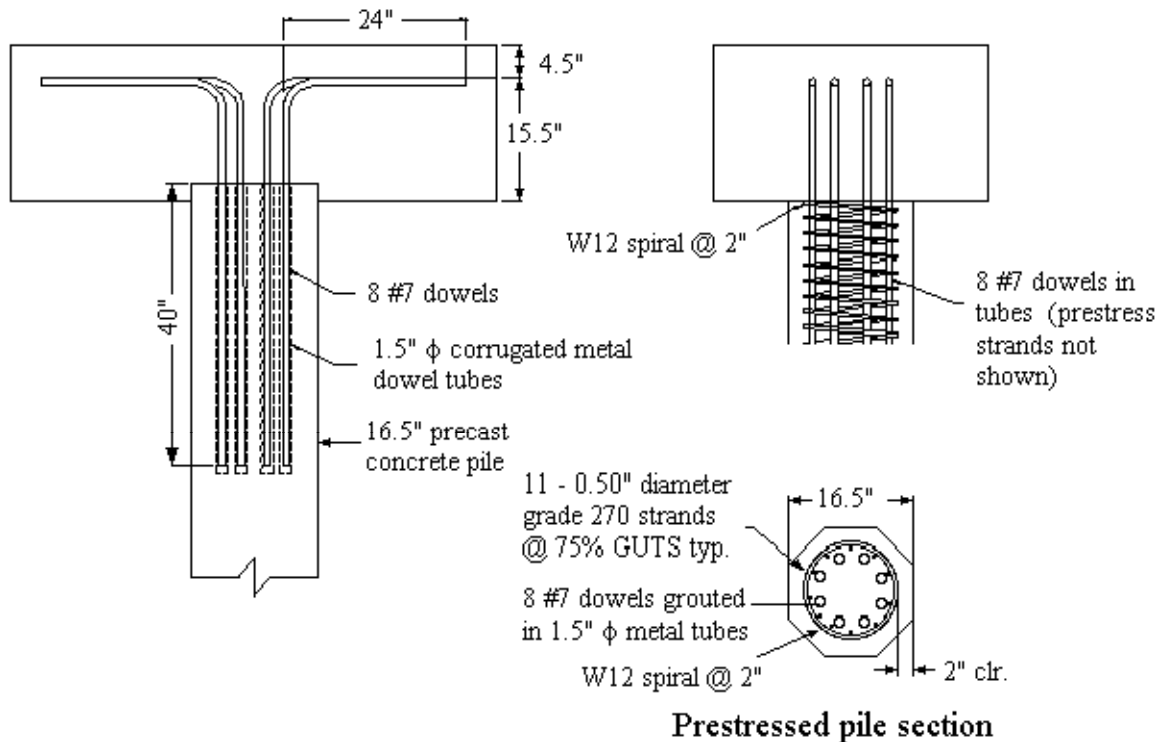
Specimens 3, 4, and 8 Reinforcement Details
